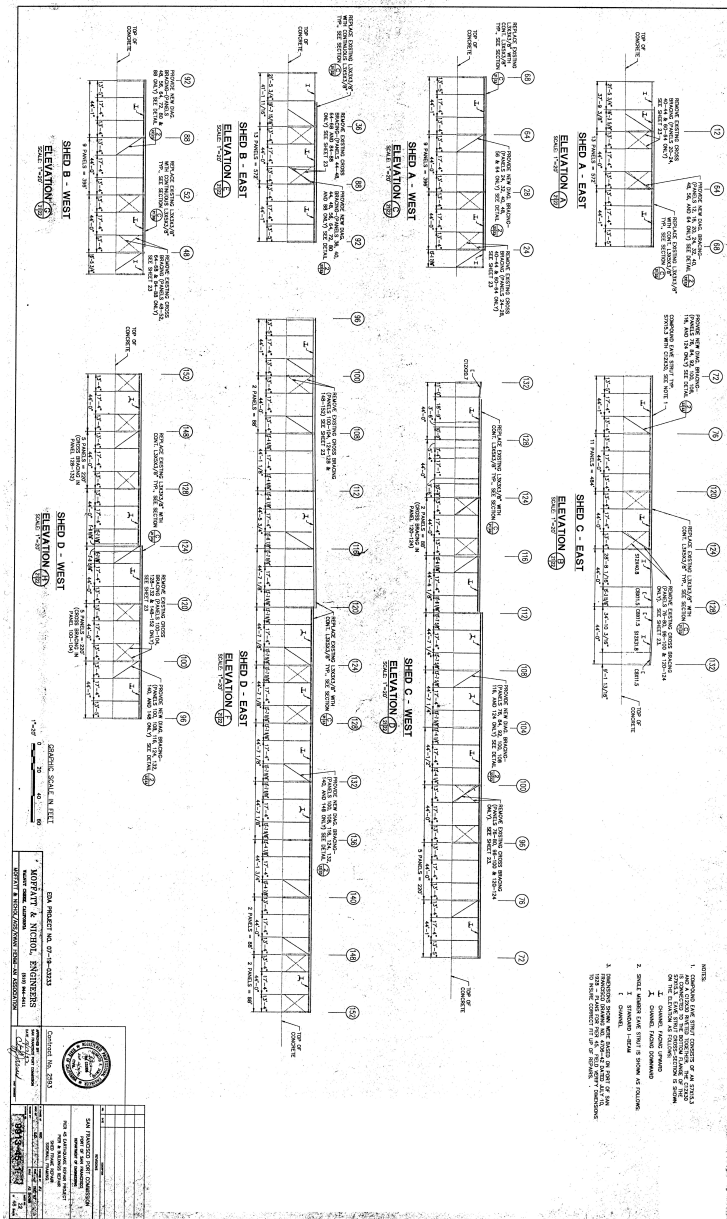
Shed elevations based on drawing no. 4706-42 dated July 10, 1928.
